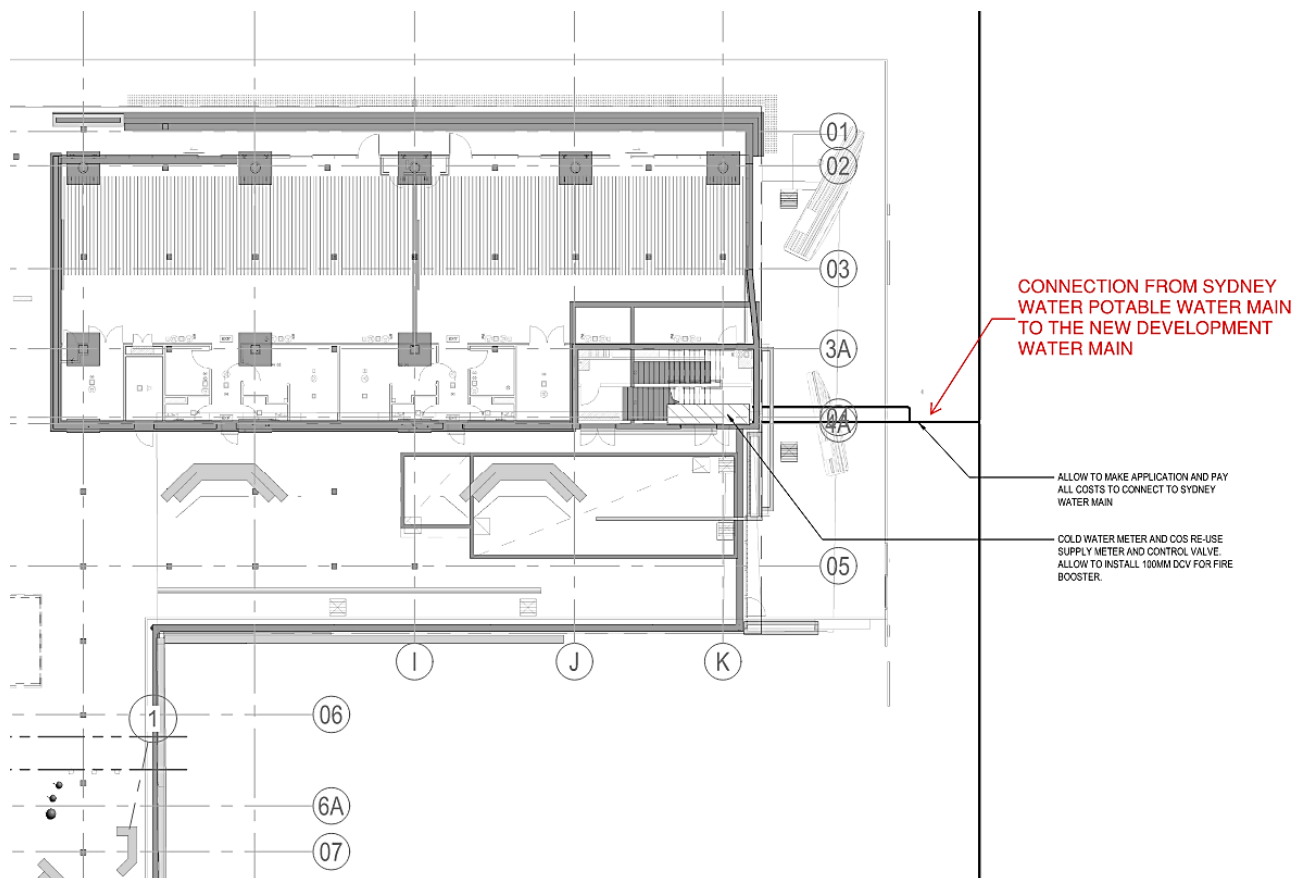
Extract from Hydraulic Services Drawing; Site Plan
